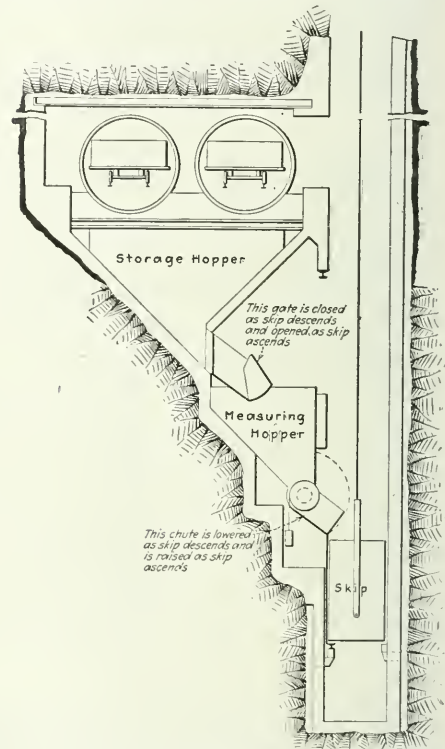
SHAFT BOTTOM DUMPING ARRANGEMENT, STANDARD OIL CO.
